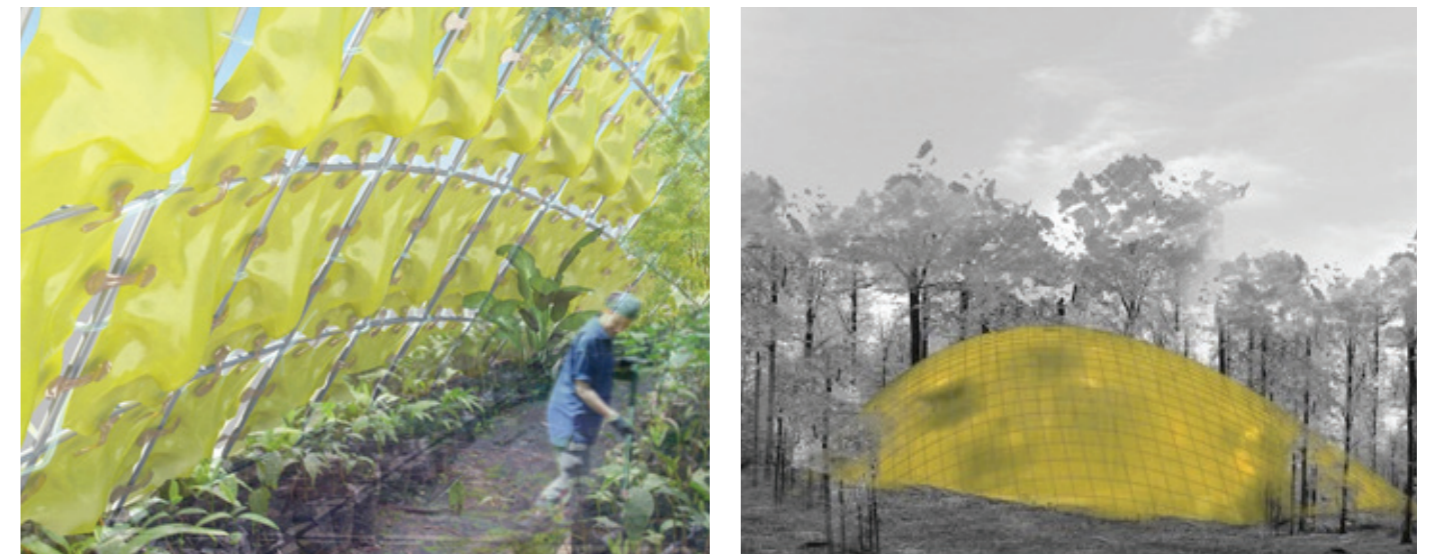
Details of the roof design showing the silicon layers and dripping process
